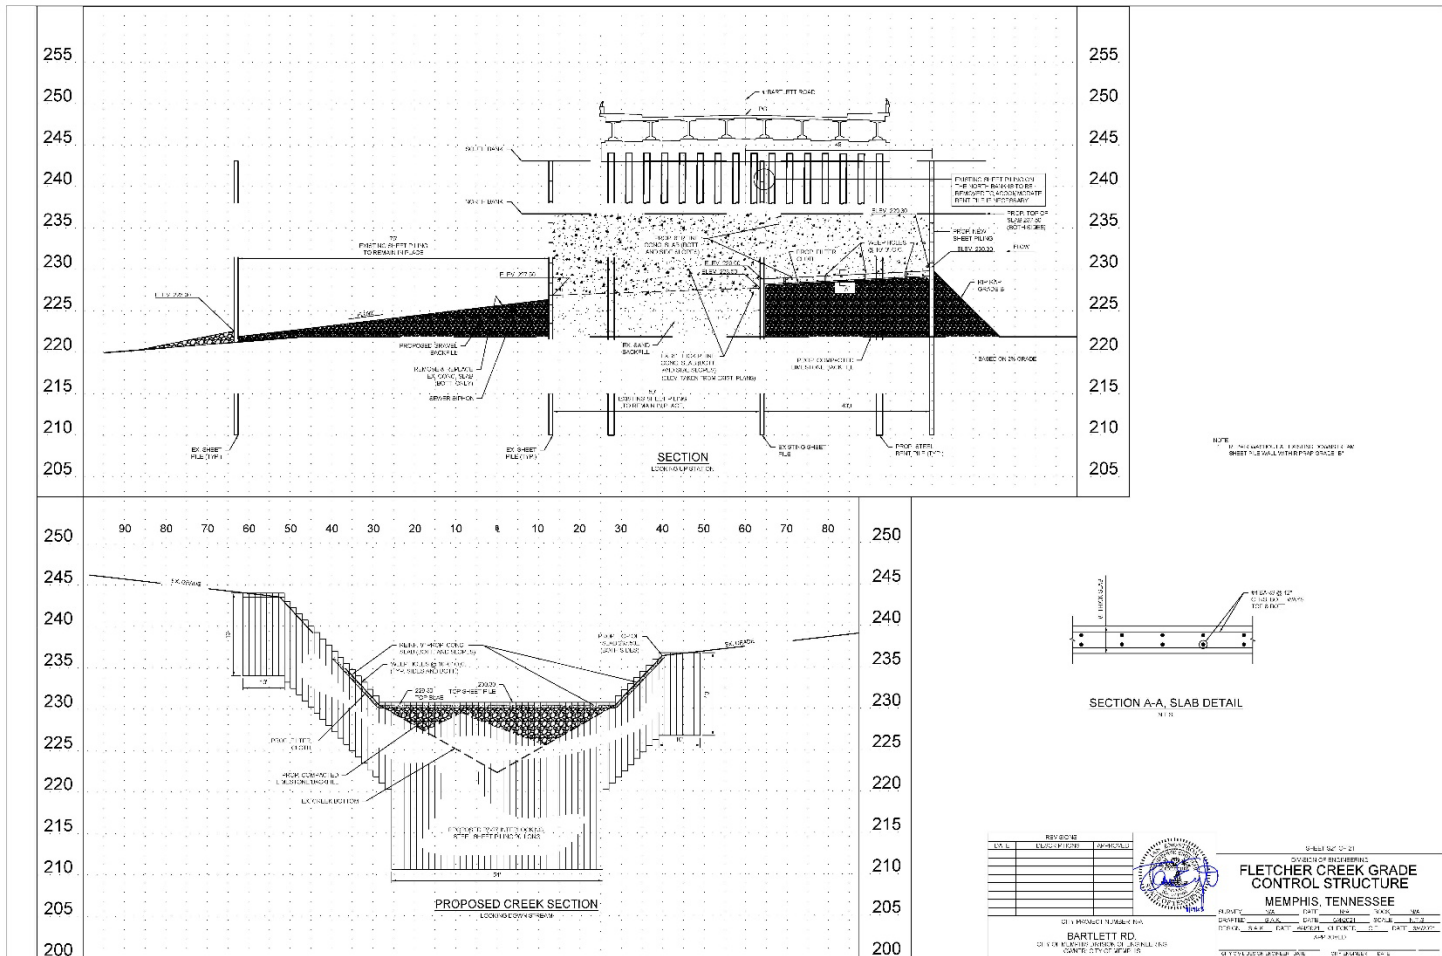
Figure 2. Proposed Section Fletcher Creek bridge replacement grade control structure, Shelby County, Tennessee.
